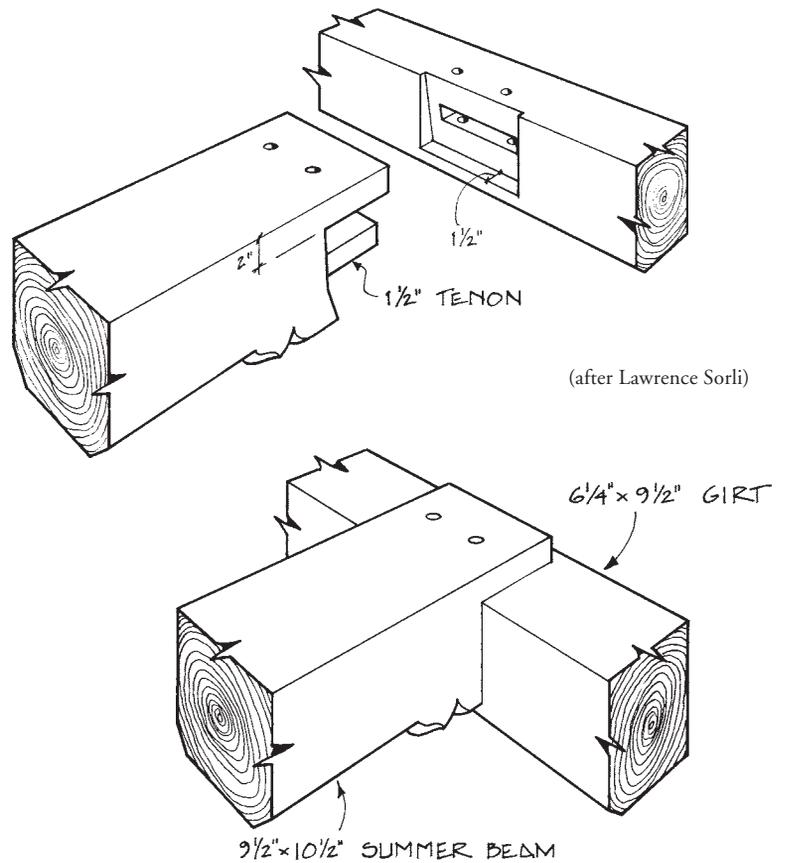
Equal-depth summer beam and girt in the 1637 Fairbanks House, Dedham, Massachusetts. The summer is raised and lapped 2 in. over the girt to gain needed support at the bottom of the joint. Lack of congruency between housing and tenon shoulders is unexplained.
